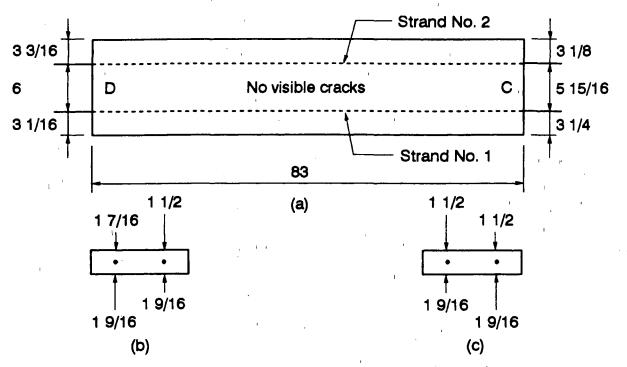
Specimen No. 2-3.0TC-7 (dimensions shown in inches):
